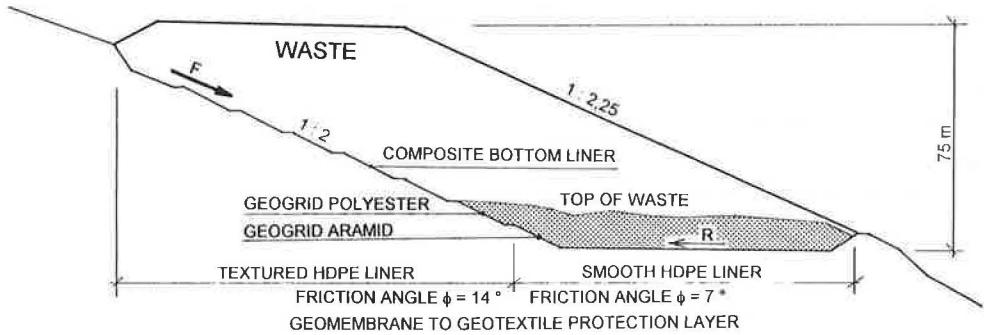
Multiple-Berms-Slope-Design, Cross Section
